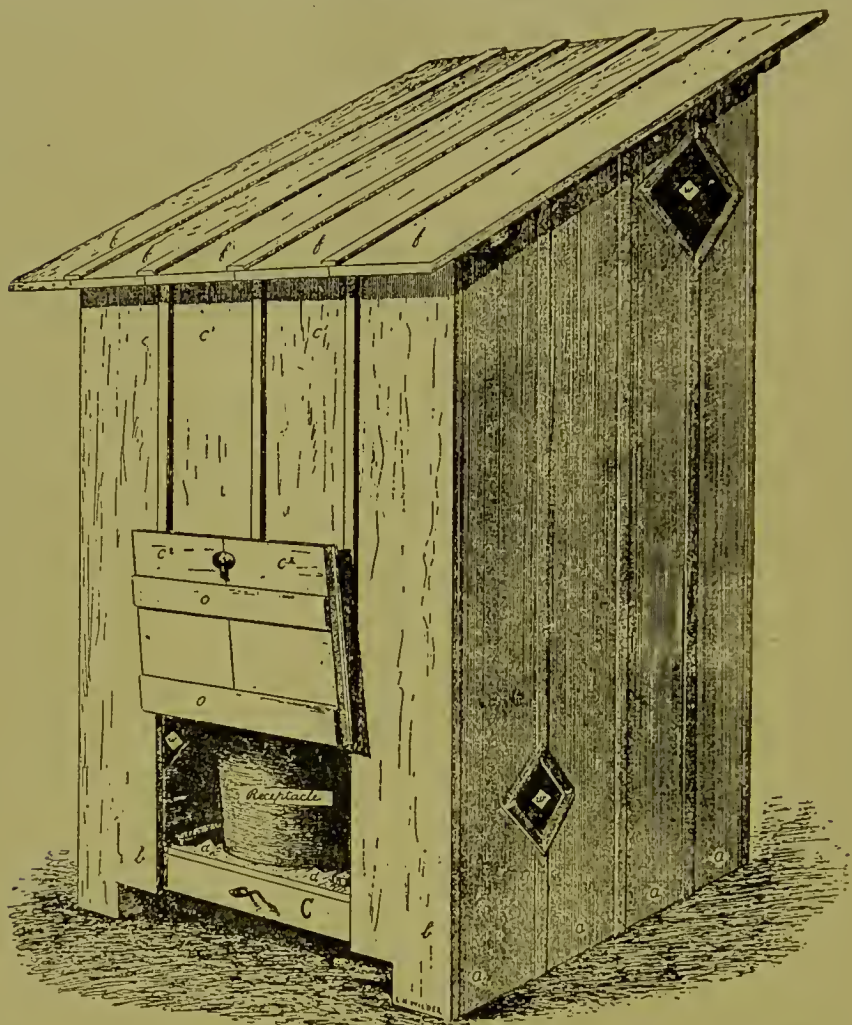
Rear and side view of privy shown in Fig. 28. (After Stiles.)
